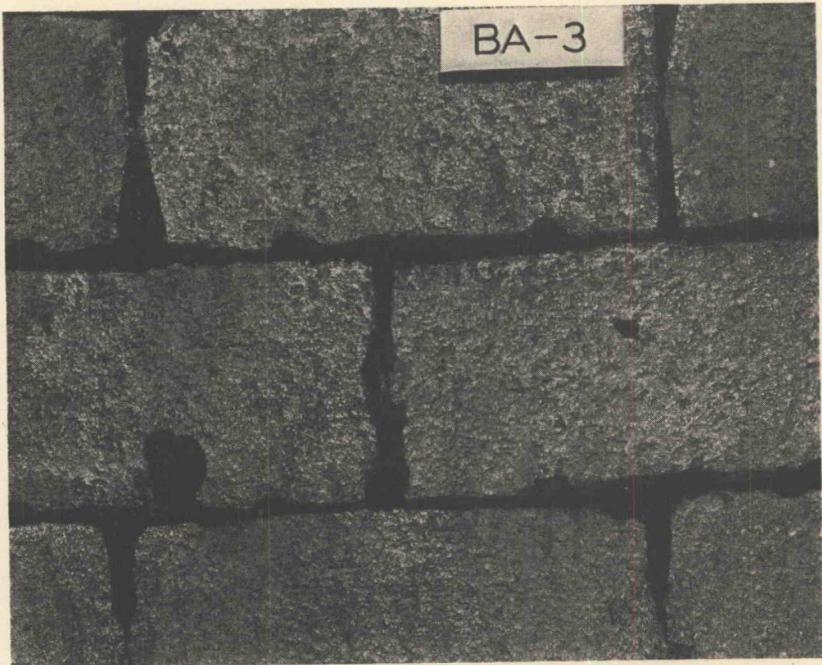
Vertical Fiber Brick Road, BA-3; April, 1934. Road Opened to Traffic in Fall of 1933.
